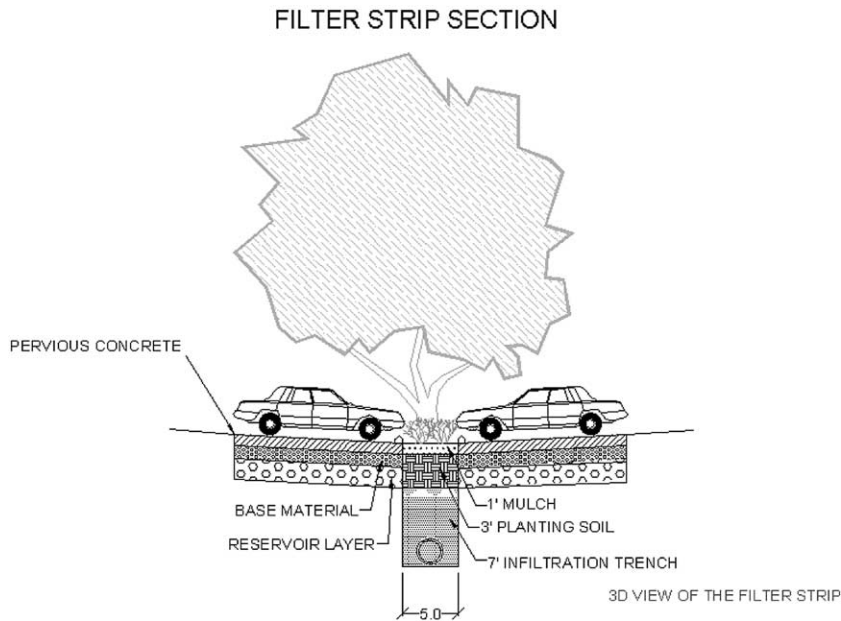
Planting island with pervious concrete, filter strip, and infiltration bed to promote better tree growth through increased soil volume and enhanced on-site stormwater retention.
